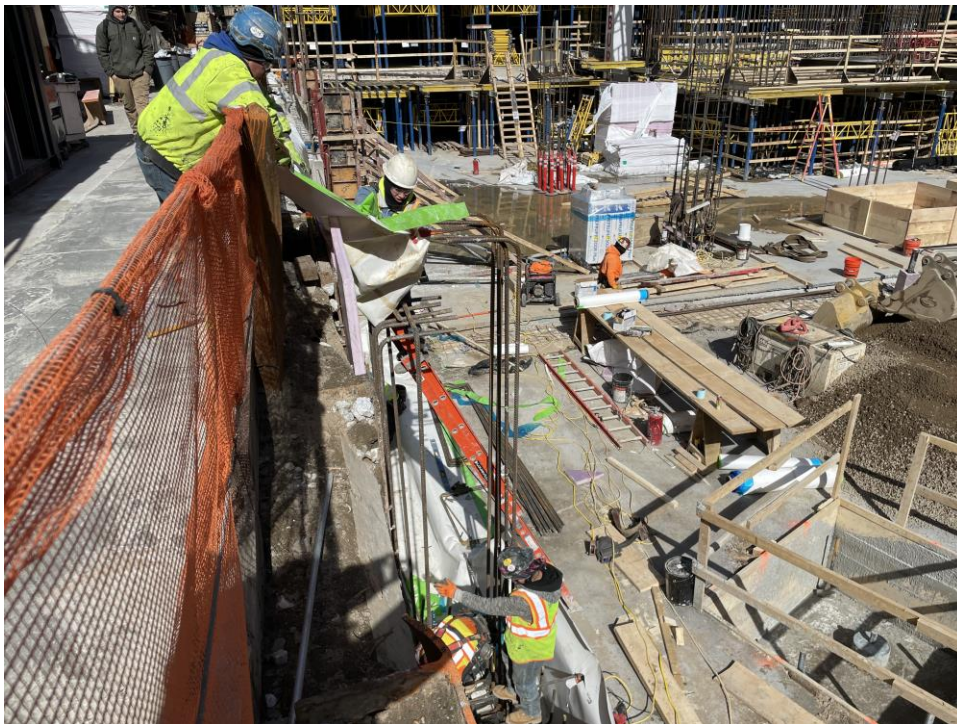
ECD applying waterproofing to the foundation wall in the western part of the site (facing northeast).
